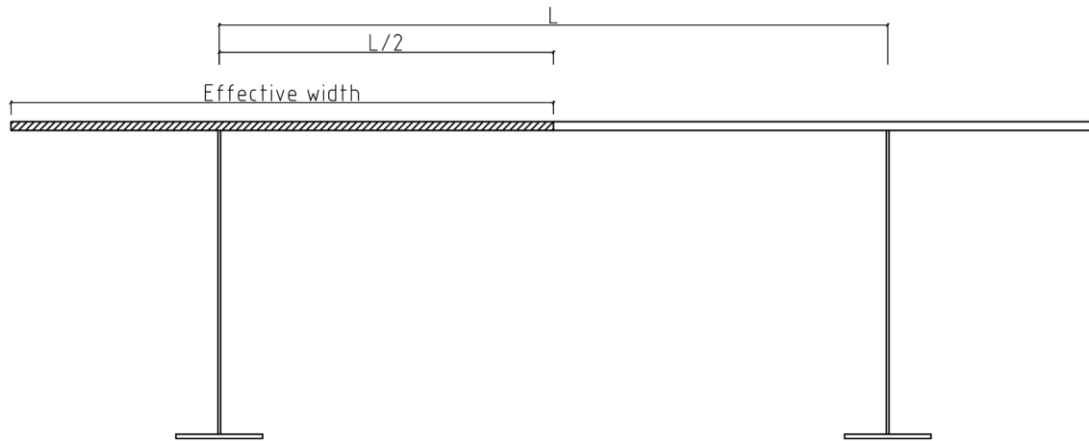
Cross-section of the main girders, with effective flange width marked for the left main girder.
